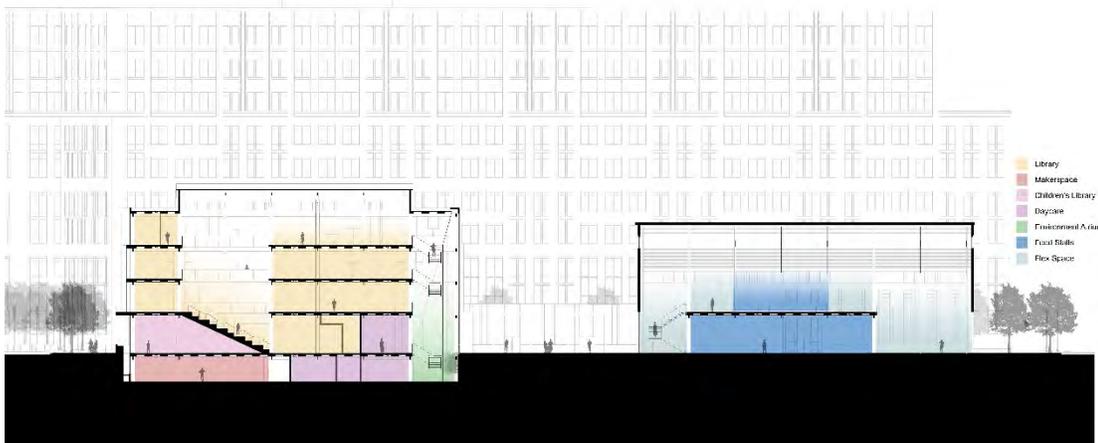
Longitudinal Section - illustration of program (Source: Author)
